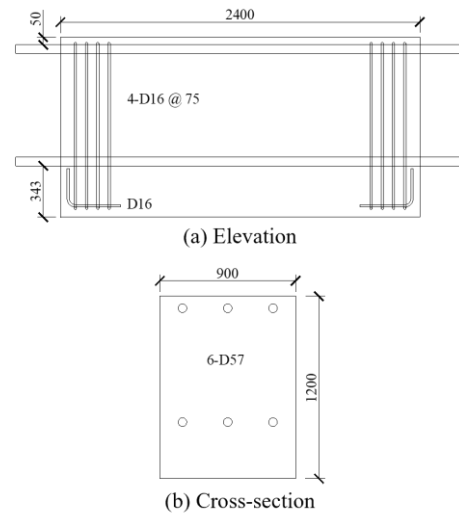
Dimensions and reinforcing details of specimen (Unit: mm).
